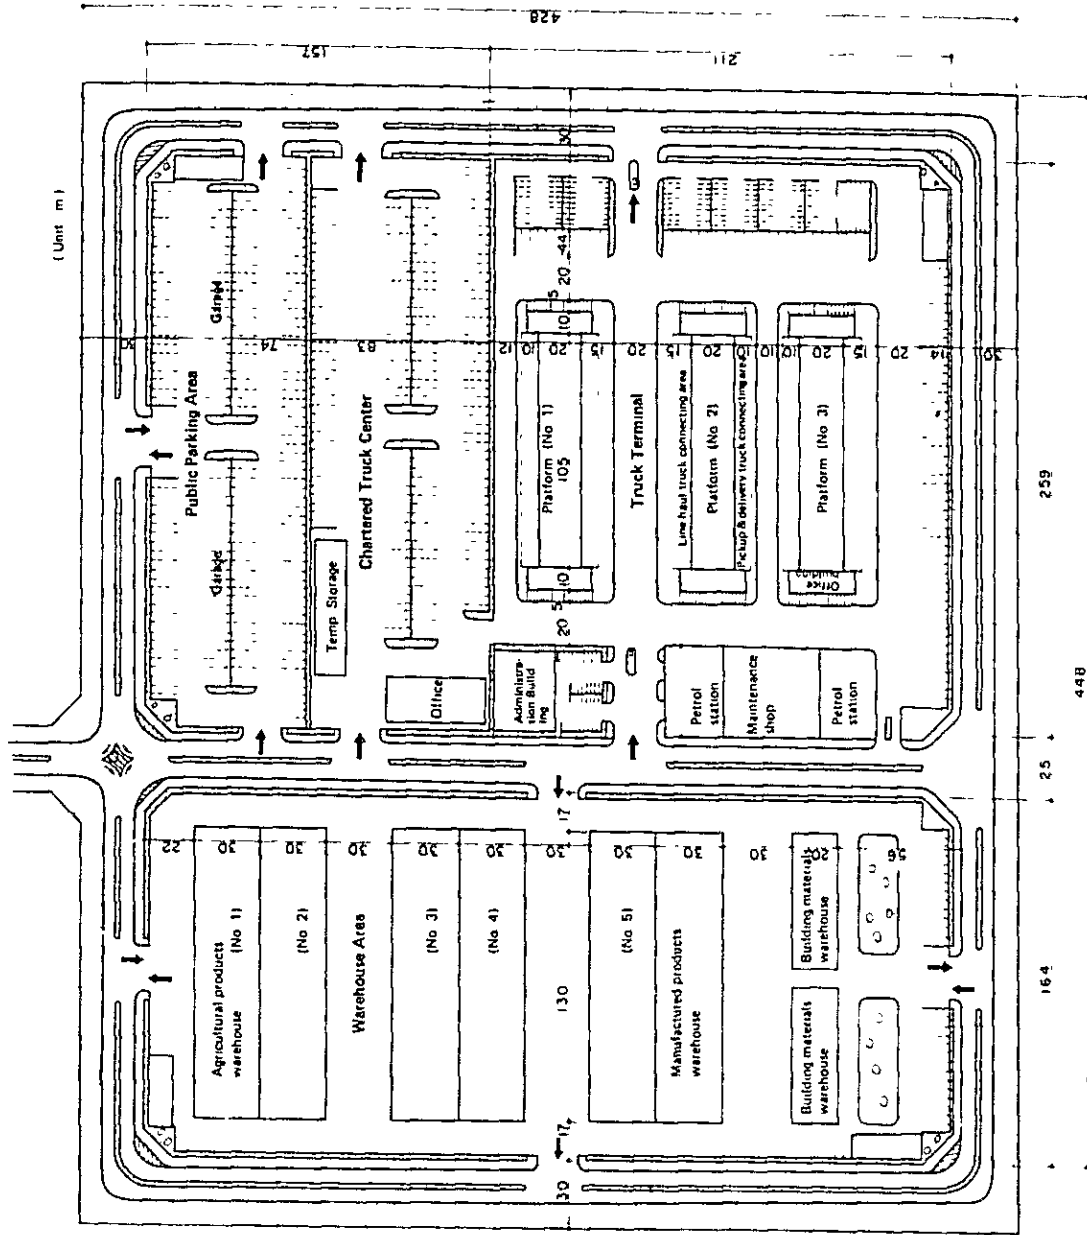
TERMINAL-W LAYOUT (ALTERNATIVE-33)
